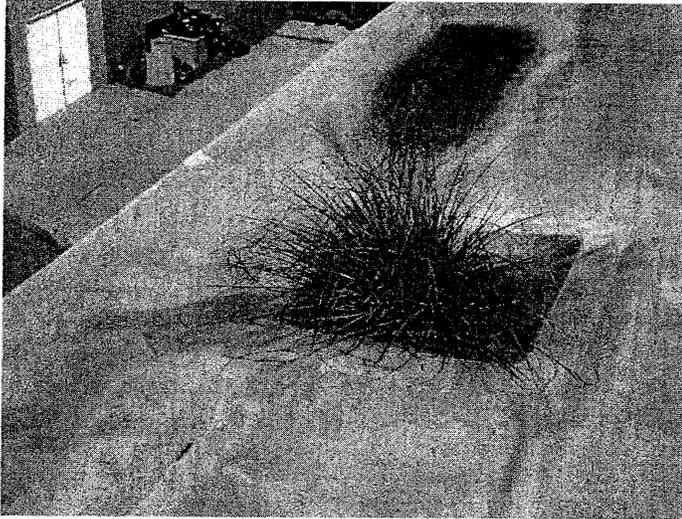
Photo showing (one of many) clogged roof drain. Very marginal maintenance at roof drains is also compounding problems w/drainage. Future roof system warranties should incorporate a companion inspection/maintenance program to help prevent these kinds of problems.
